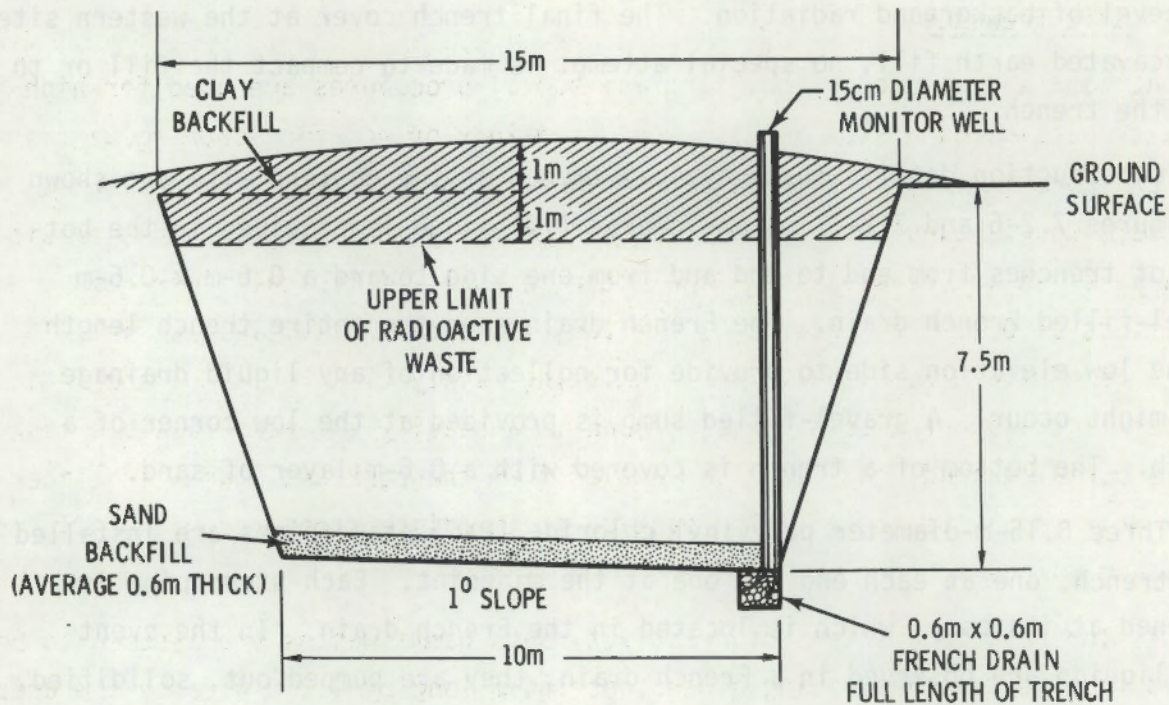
Typical Trench Cross Section for Eastern Site
